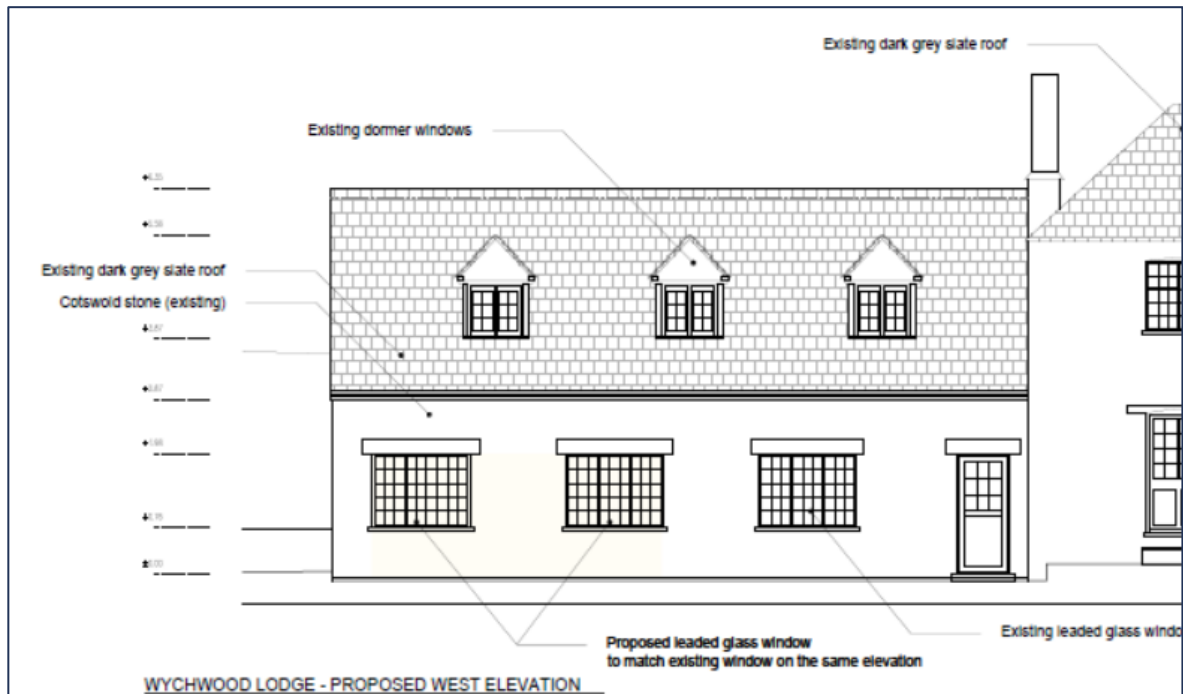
Extract from drawing 501 L 02 05 PROPOSED
